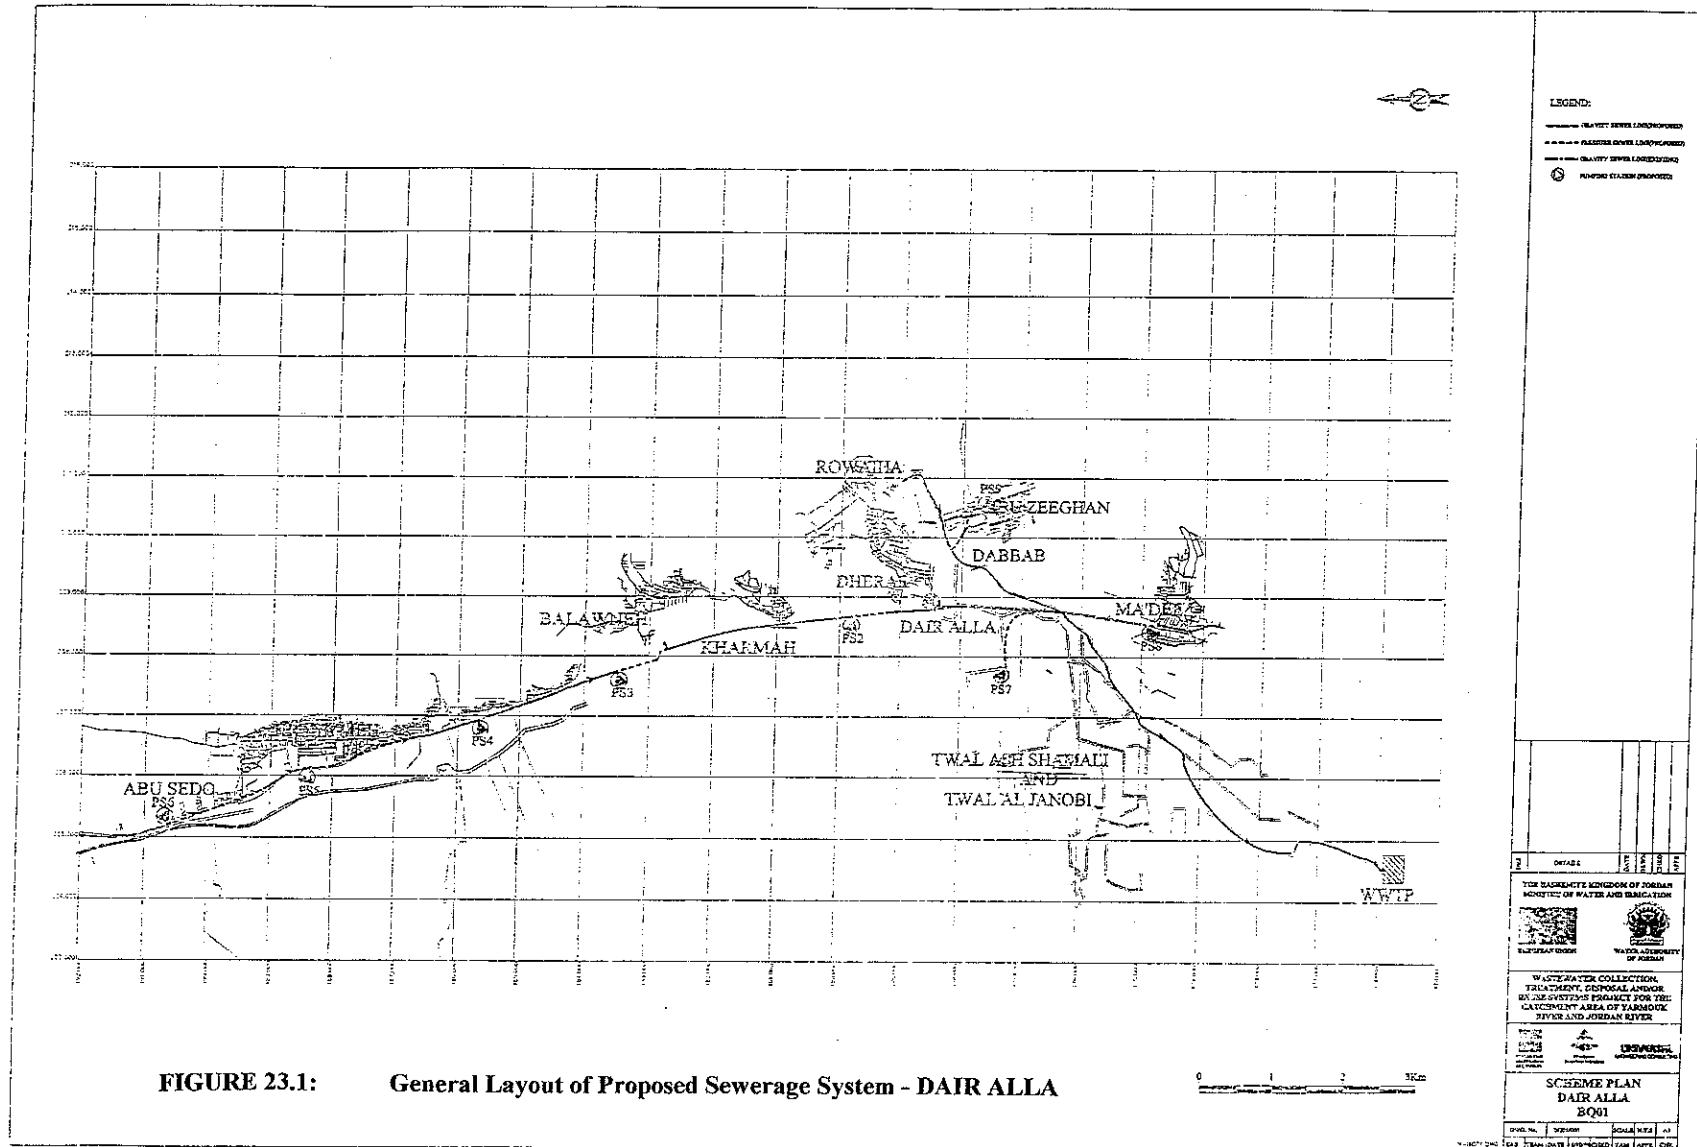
General Layout of Proposed Sewerage System - DAIR ALLA
